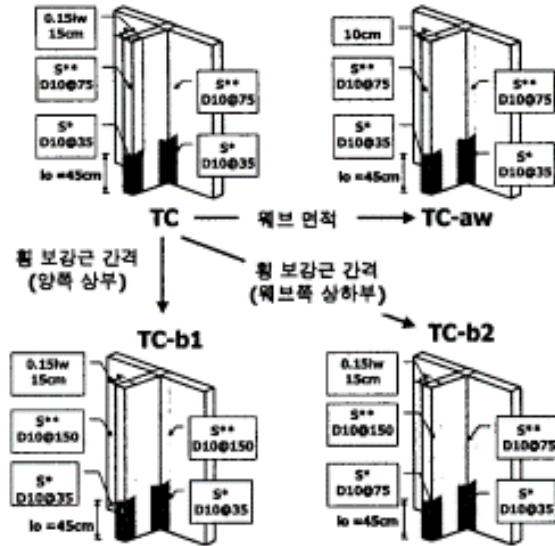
Test Specimen Reinforcement Details for Specimens TC-aw, TC-b1, and TC-b2 Choi et al. [47, 86]
